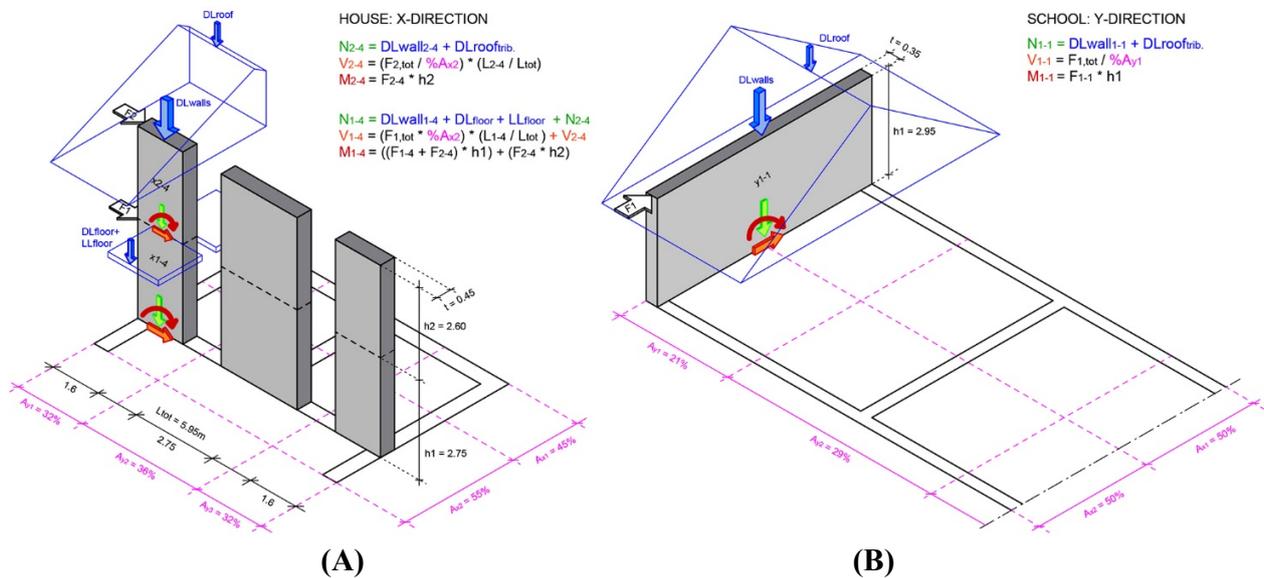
Division of mass and internal actions on a cantilevered pier for (A) the house and (B) the school design (all by courtesy of Smart Shelter Foundation).
